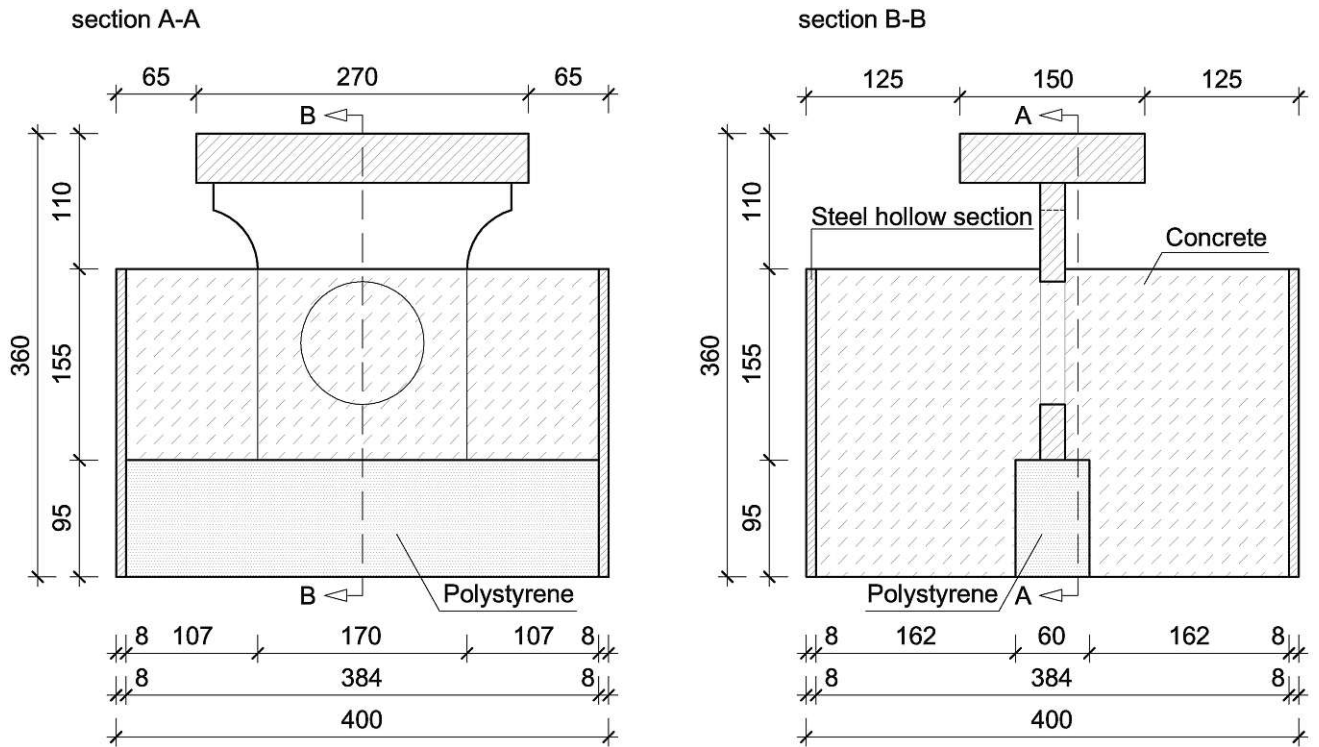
The complex specimen to execute the laboratory tests. Dimensions in [mm]
